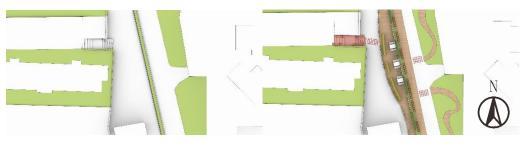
Plan Before and After the Design (Source: Drawn by the author)
